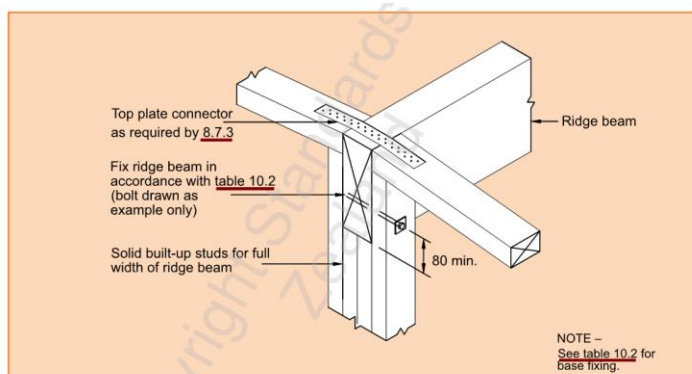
Example of fixing ridge beam to wall (see 10.2.1.5.2)
